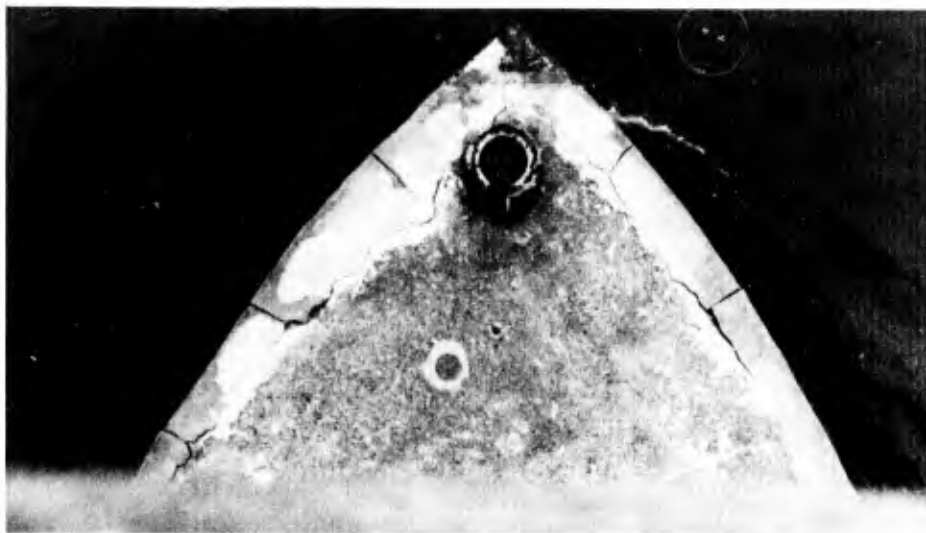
Poor repair; epoxy mortar repair to concrete pier which has failed, Lock and Dam No. 24, Mississippi River
